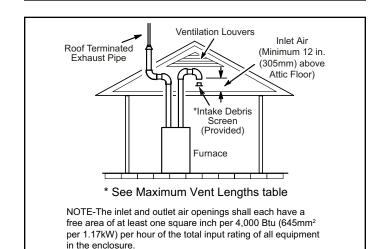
Equipment in Confined Space (Inlet Air from Ventilated Attic and Outlet Air to Outside)
